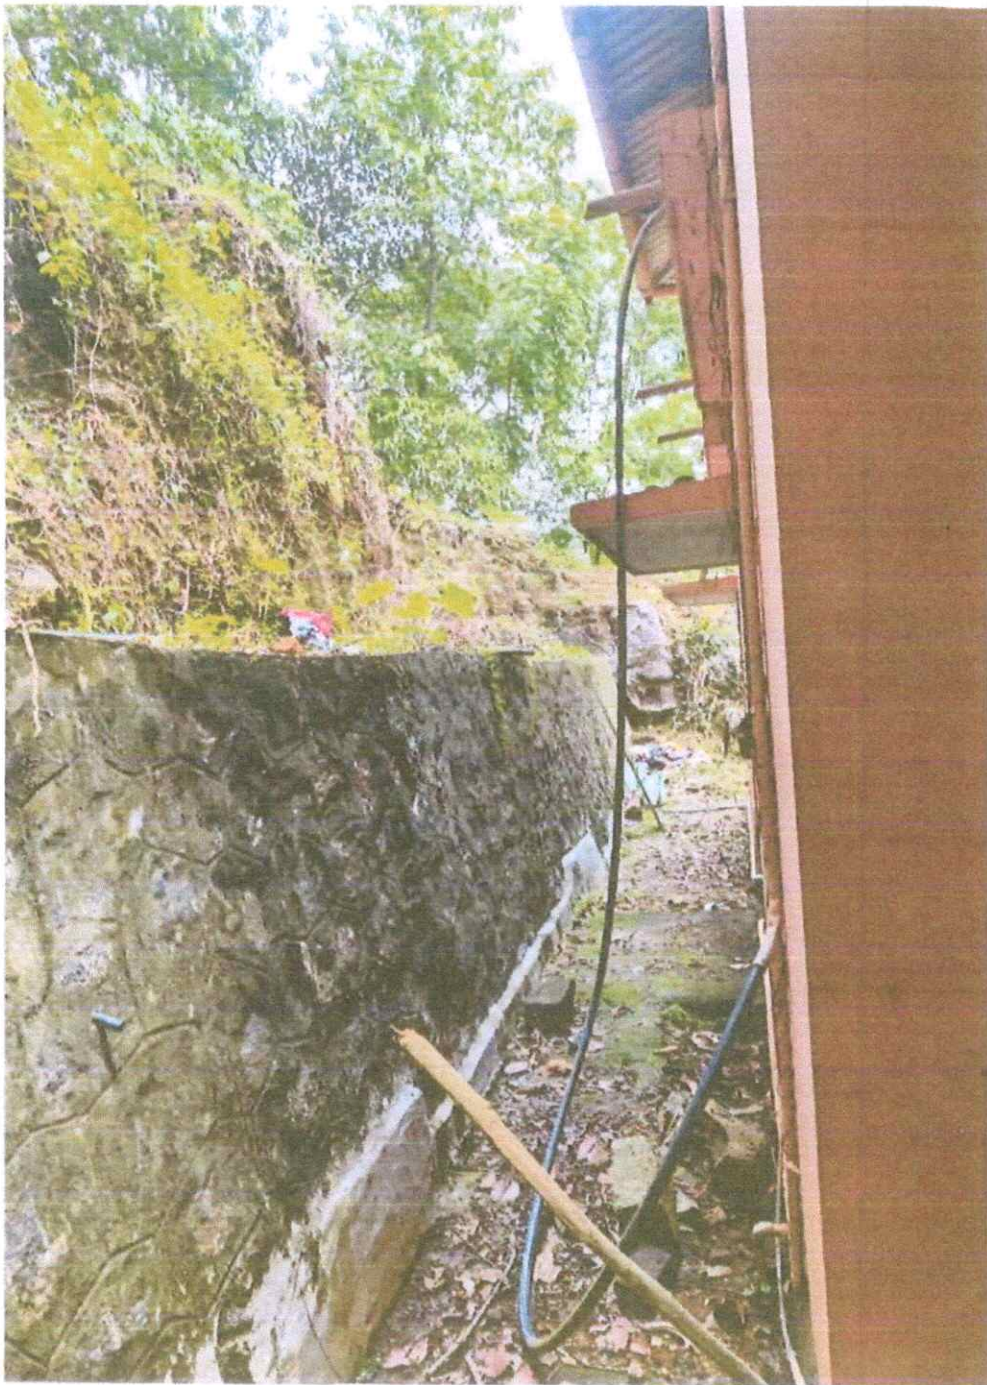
VIEW OF ROCK AND SOIL BENCH BEHIND THE HOUSE
